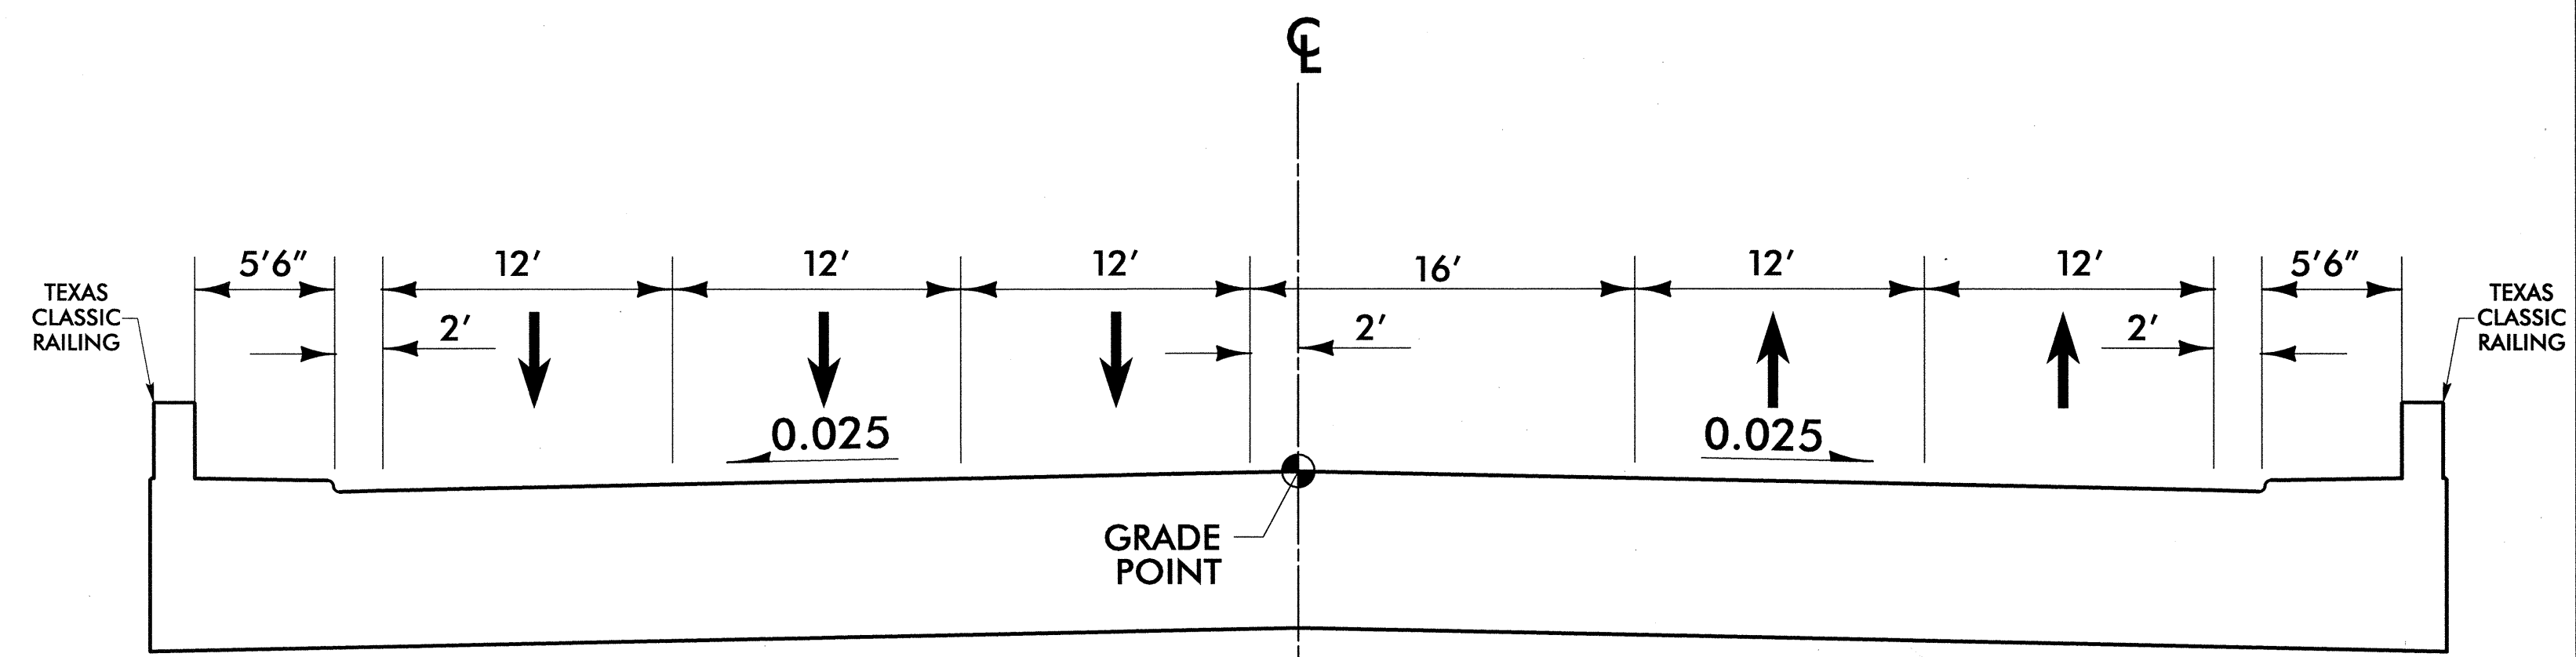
DETAIL FOR STAGE 1 CONSTRUCTION OF BRIDGE
